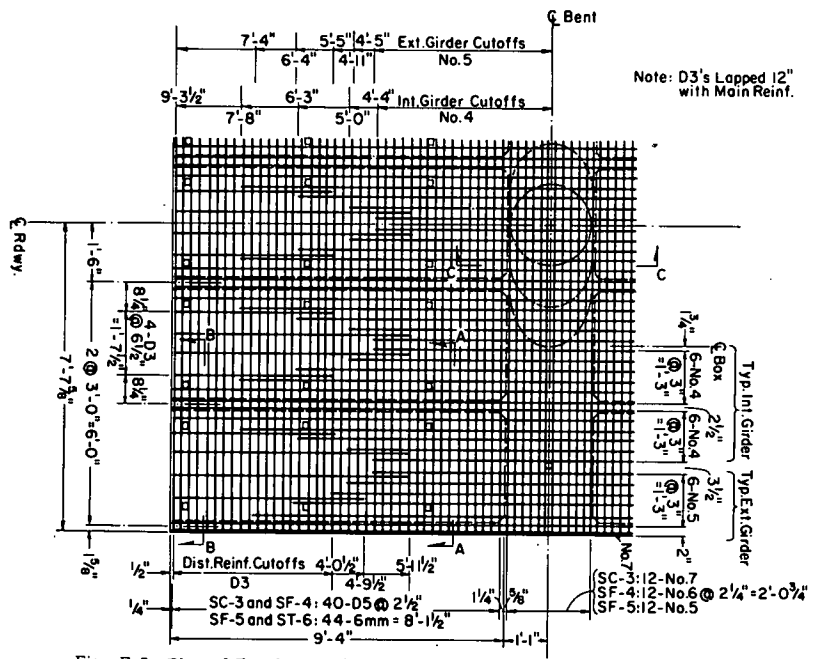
Plan of Top Layer of Deck Reinforcement and Main Bent Cap Reinforcement for Single-Column Specimens
